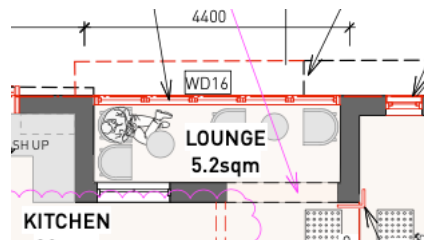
, First Floor: Existing internal double doors to be removed to lounge area.
